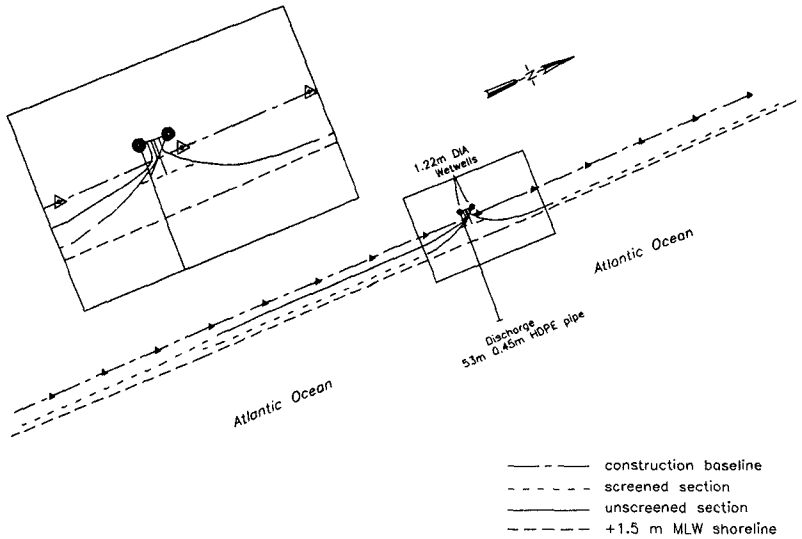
Plan-view schematic of Lighthouse North STABEACH segment.
